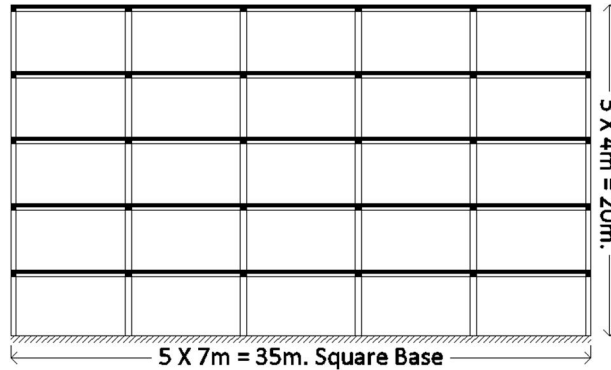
Sectional elevation of 5-storey RC frame structure
